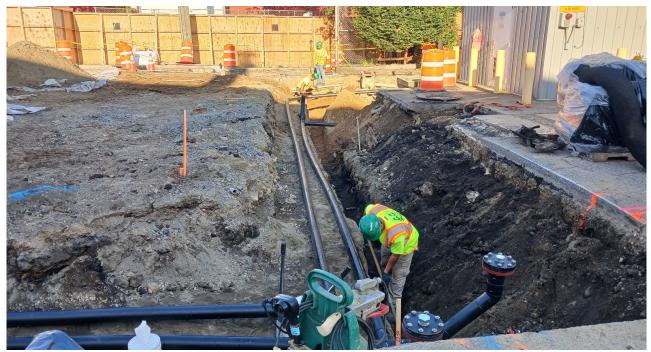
View facing west. View of CAC installing piping for the water/sprinkler line.
